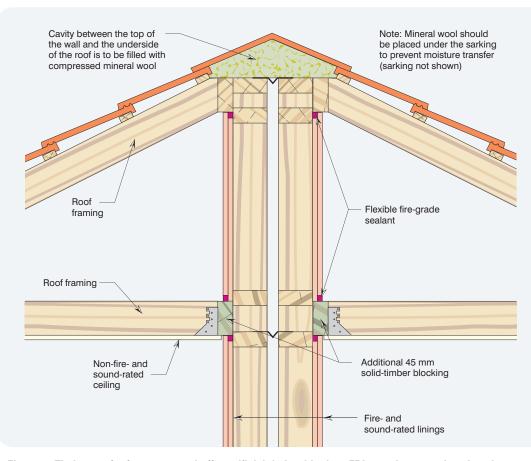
Timber roof rafter supported off sacrificial-timber blocks – FRL 60 minutes – elevation view.
